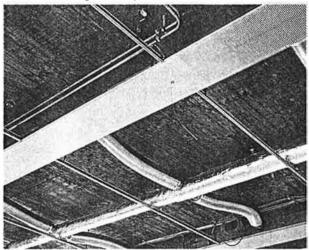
Air and water side connection of the cooled ceiling panels
